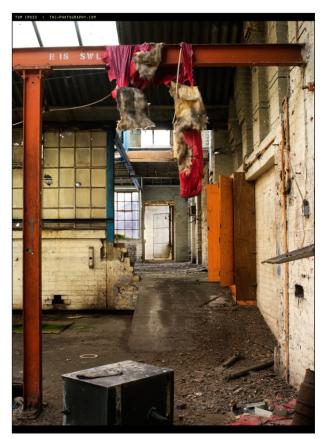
Southern end of the first floor with ramp to adjacent Building 15
